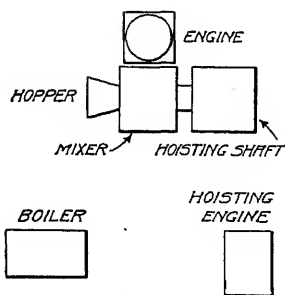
Diagrammatic Layout for Typical Concrete Plant
